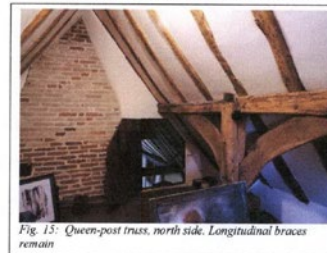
Queen-post truss, north side. Longitudinal braces remain
